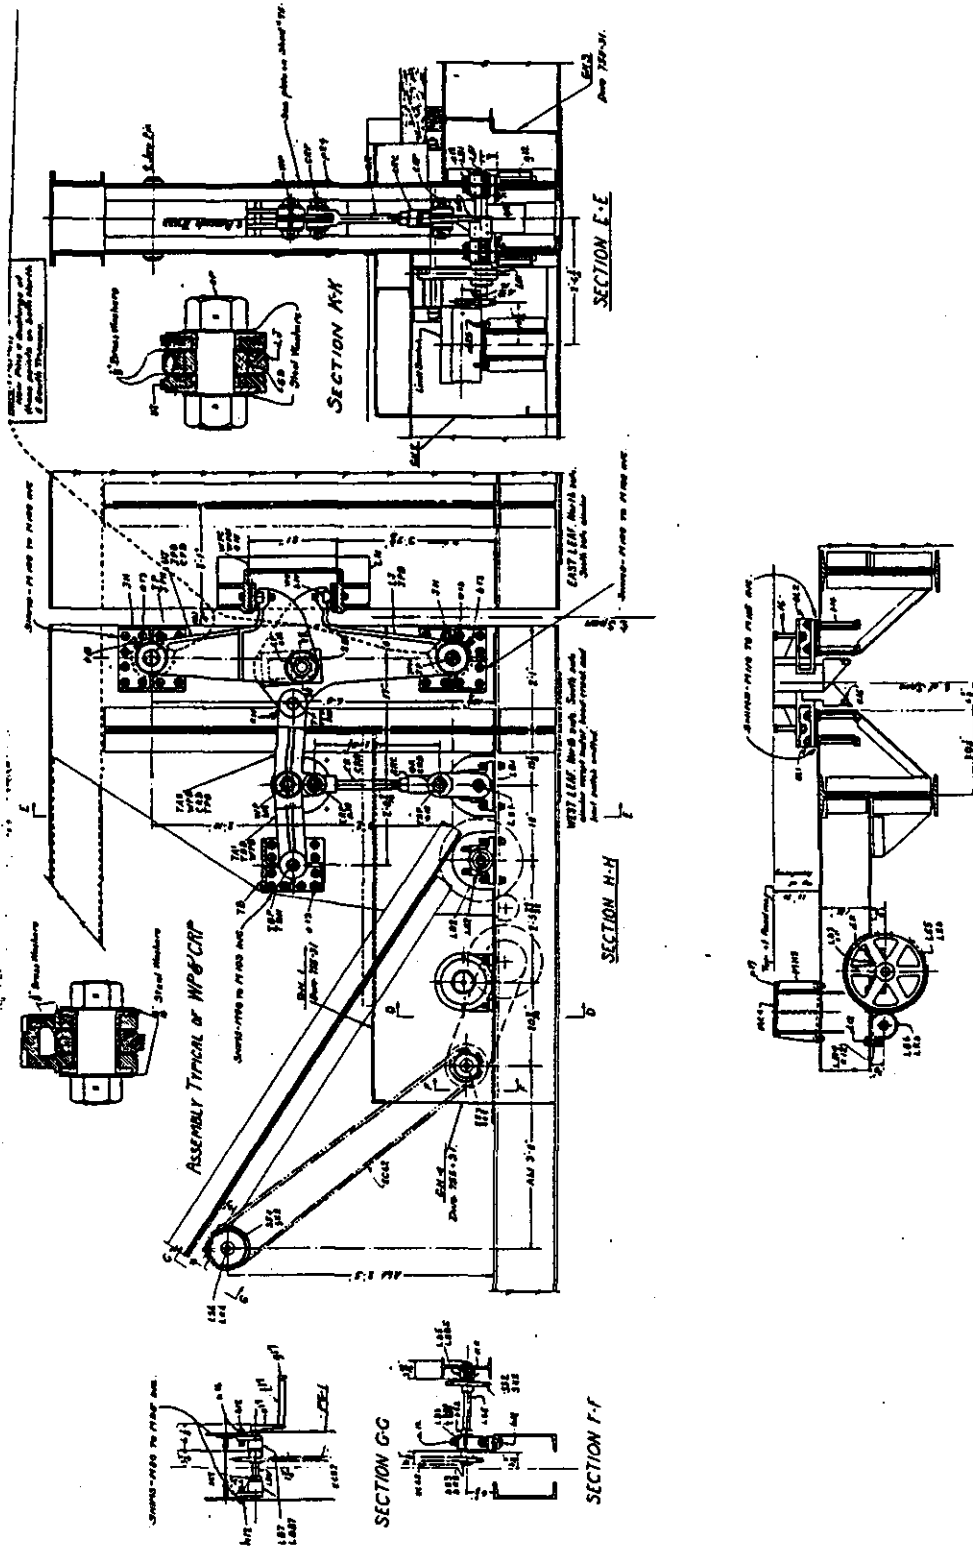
Center lock at the Hoquiam River bridge. From Wallace Bridge and Structural Steel Co., Seattle, Washington. Shop drawings for the Hoquiam River bridge bascule span (June 1927), sheet no. 755-26.
